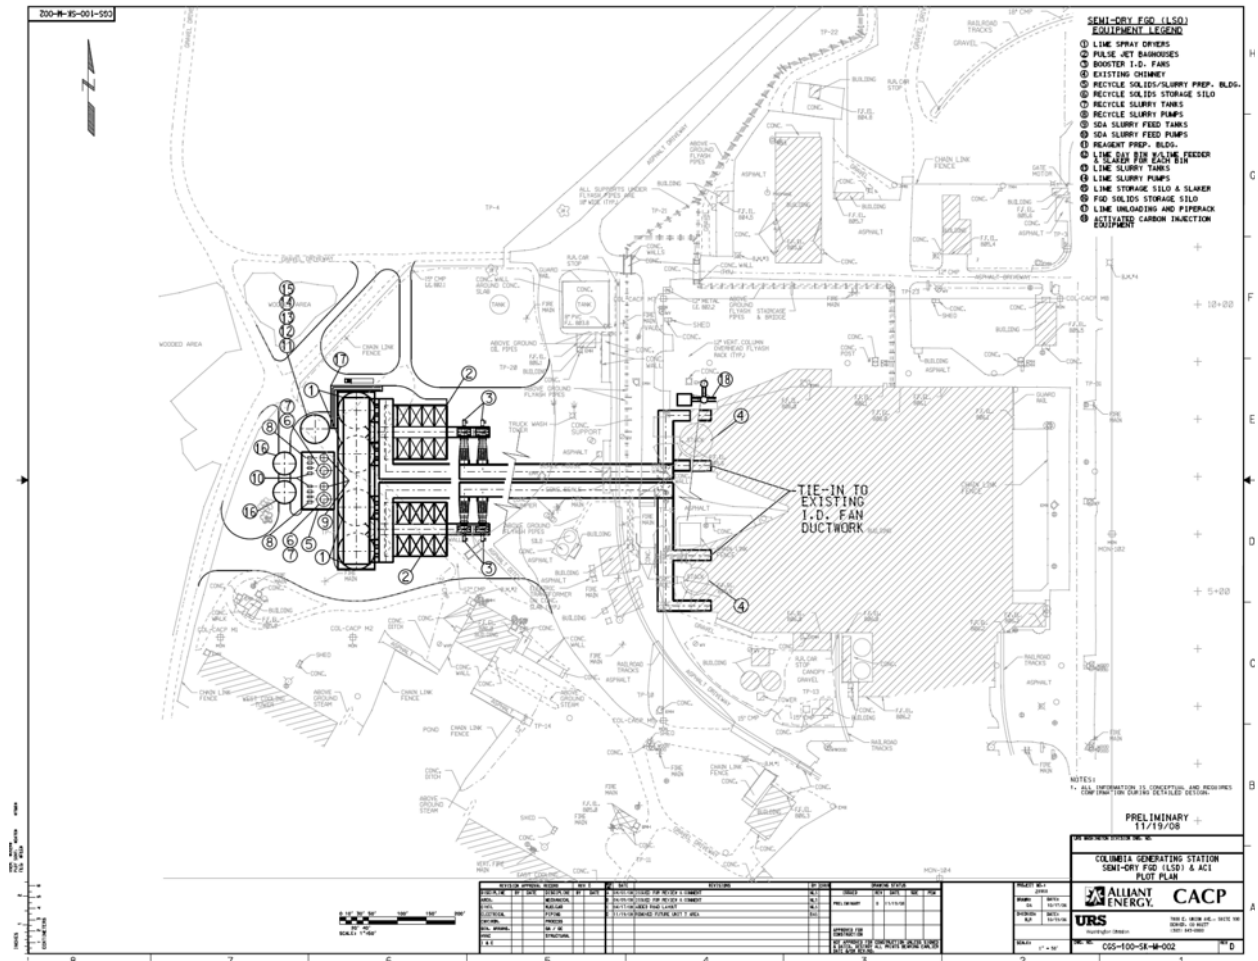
Site Layout – Proposed Columbia Units 1 and 2 Dry FGD and ACI Systems
